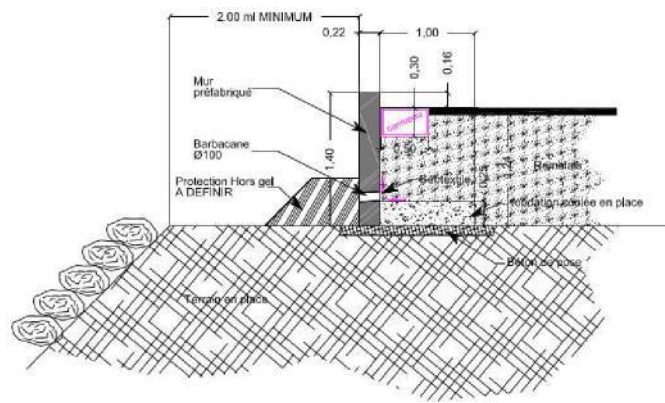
Cross-section of the retaining wall along the heavy road between QR5 and the EMR quays [25].
